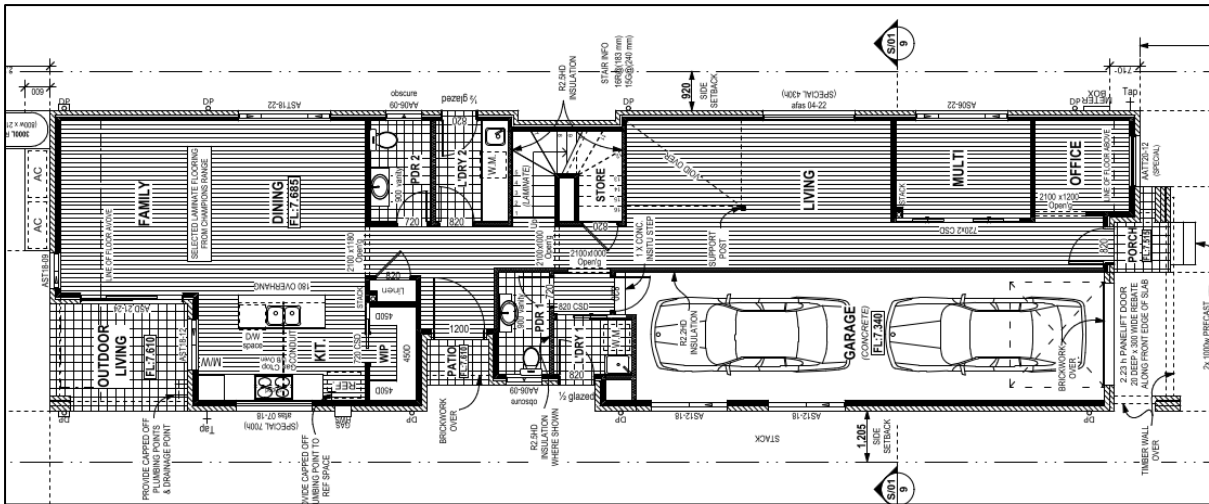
Extract of the proposed primary dwelling ground floor plan.
